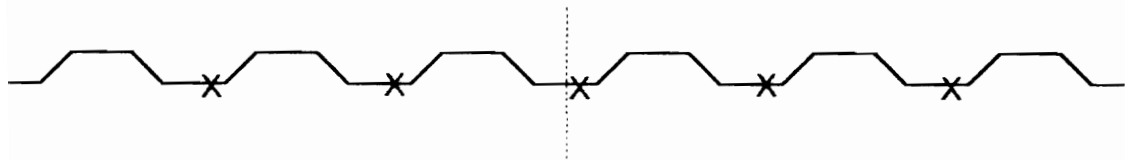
SDI-3/20-35-10 Concrete Strain Gage and Shear Stud Locations
